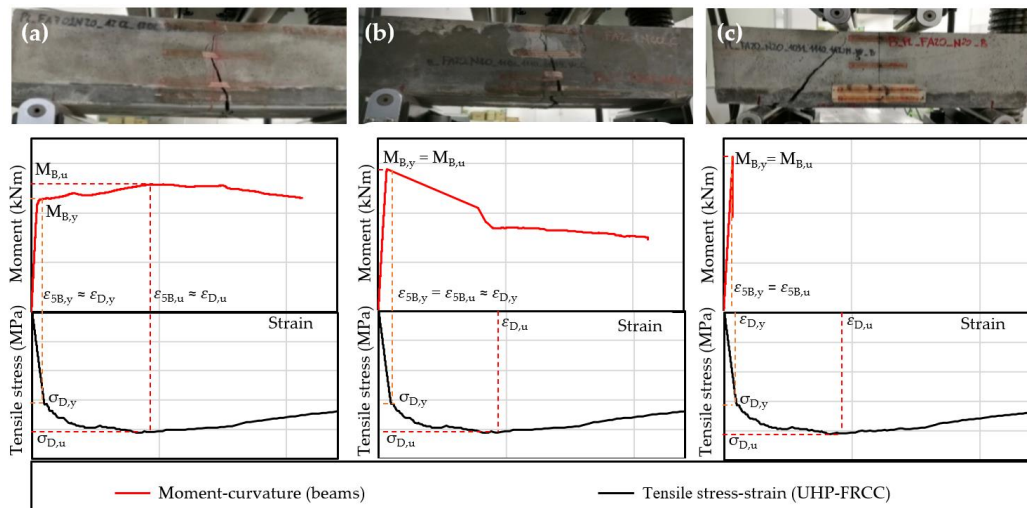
Failures of the beams in the test campaign 1: (a) failure in tension; (b) crushing in the compression zone; (c) shear failure.
